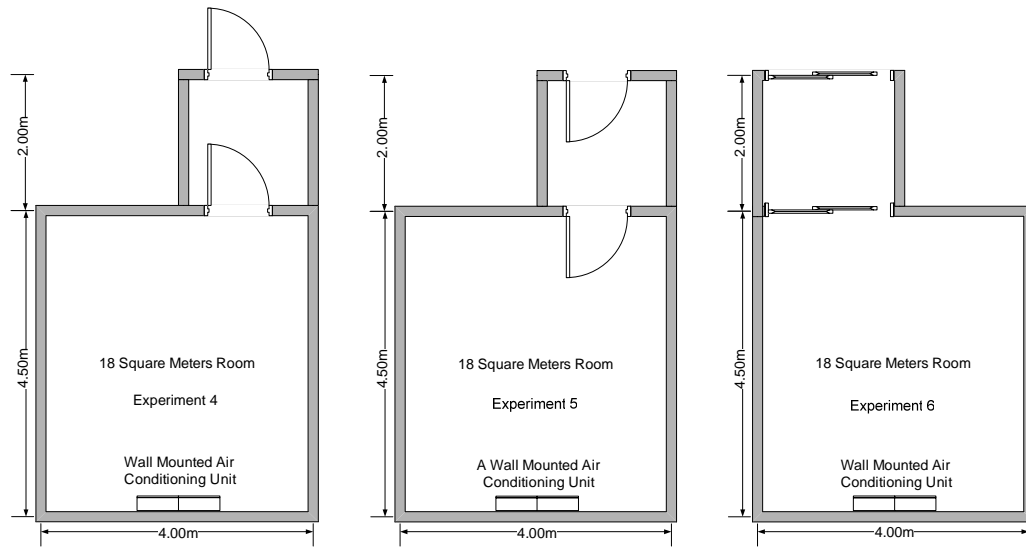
Floor Plan of Experiments 4 – 6: A Double Parallel Door
